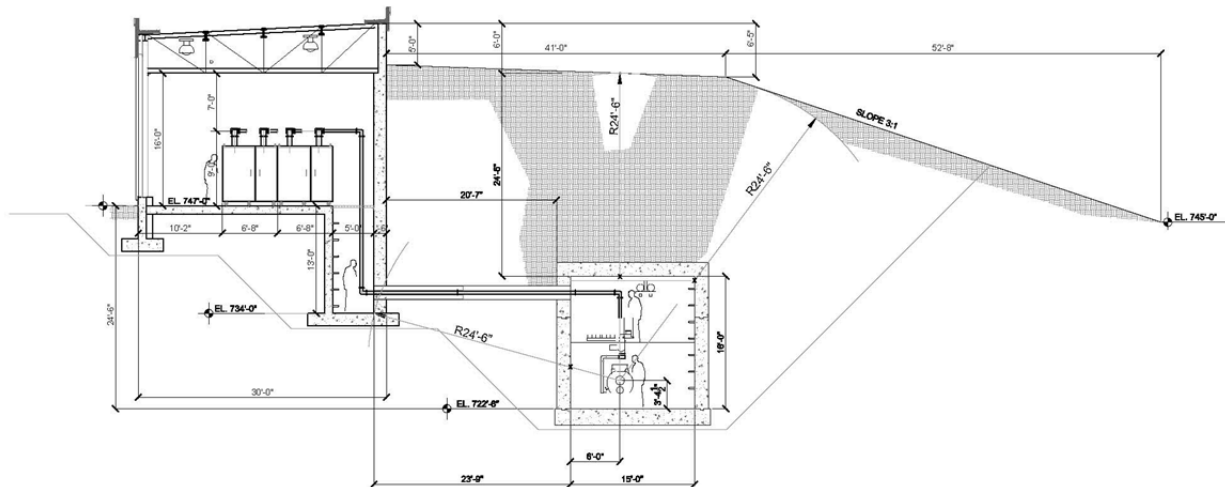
A concept cross section of the linac gallery and tunnel.
